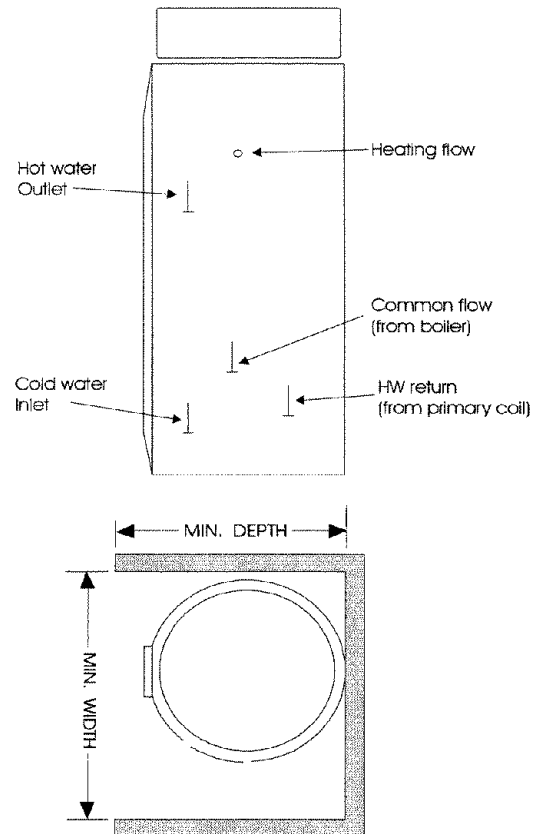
SysteMate III Connection arrangement (For minimum cupboard dimensions see Table 1.1)
